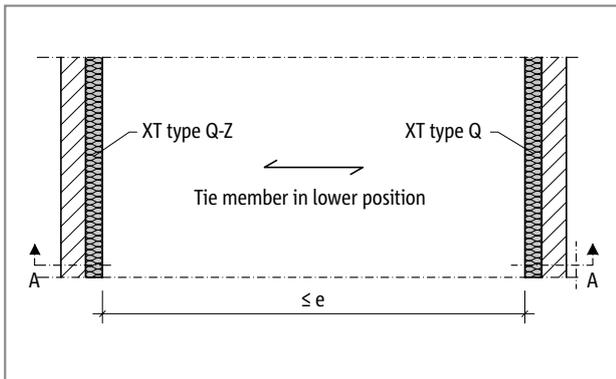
Schöck Isokorb® XT type Q-Z, Q: One-way spanning reinforced concrete slab
